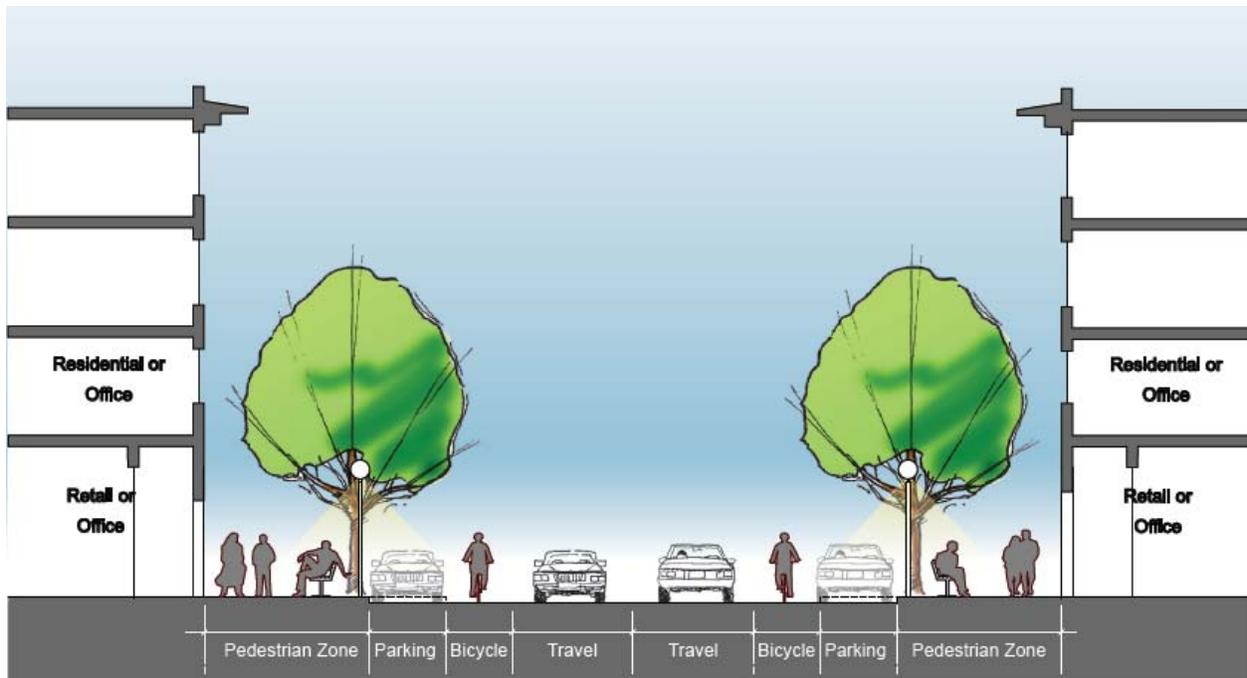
59th Street between Folsom Boulevard and S Street, and Elvas Avenue between 65th Street and Folsom Boulevard
